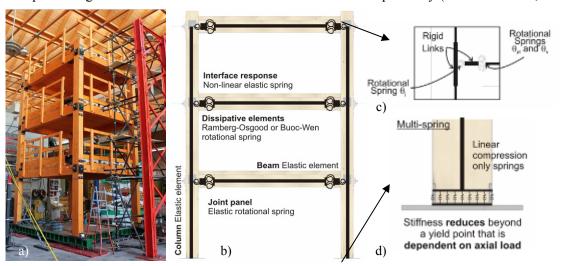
a) Experimental frame constructed in UNIBAS laboratory, numerical model of b) test frame, c) beam-column joint and d) column/foundation interface.
